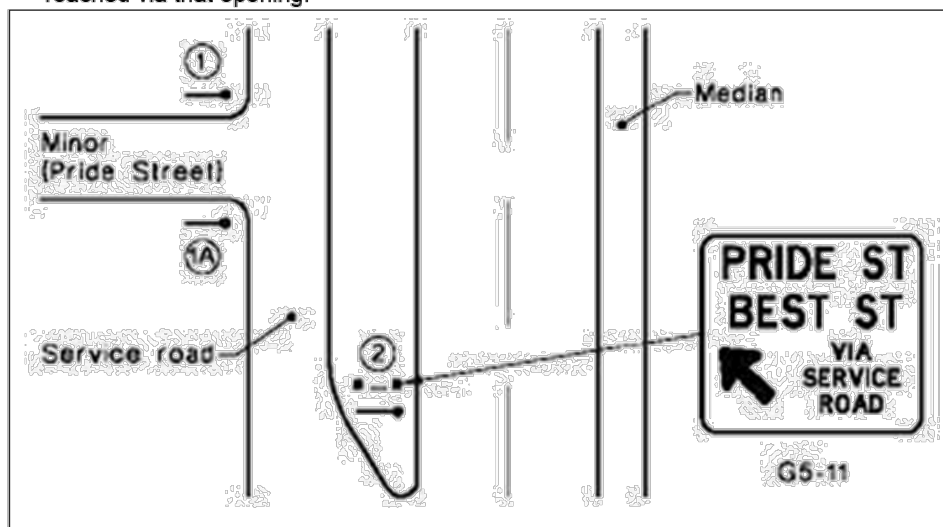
INTERSECTION OF A MINOR STREET WITH A SERVICE ROAD
